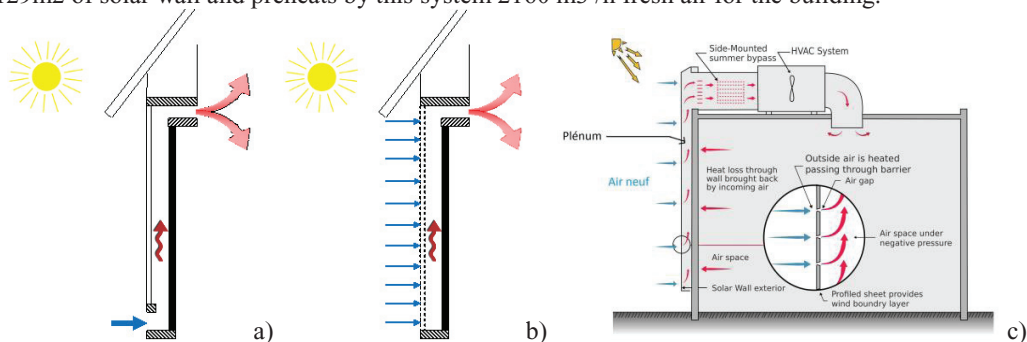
Sollar walls: a) Classical Trombe wall, b) Unglazed transpired solar wall, c) Mixed Glazed and Unglazed SollarWall® from Conservall Engineering Inc. [5]
